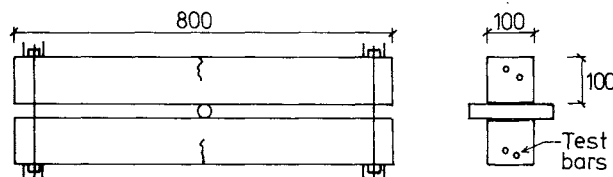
Test beam for crack experiments. Two reinforcement bars with two different concrete layers were placed in each beam. The bars were so short that they were overlapped with the ribbed bar. Each beam had bend-up bar reinforcements consisting of 10 smooth bars with a diameter of 6 mm.
